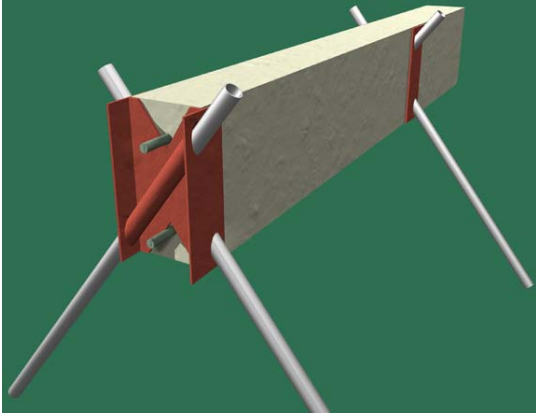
Pier support system for minimal excavation foundation (Sources: Pin Foundations, Inc., Hinman, 2005, p. 129)
